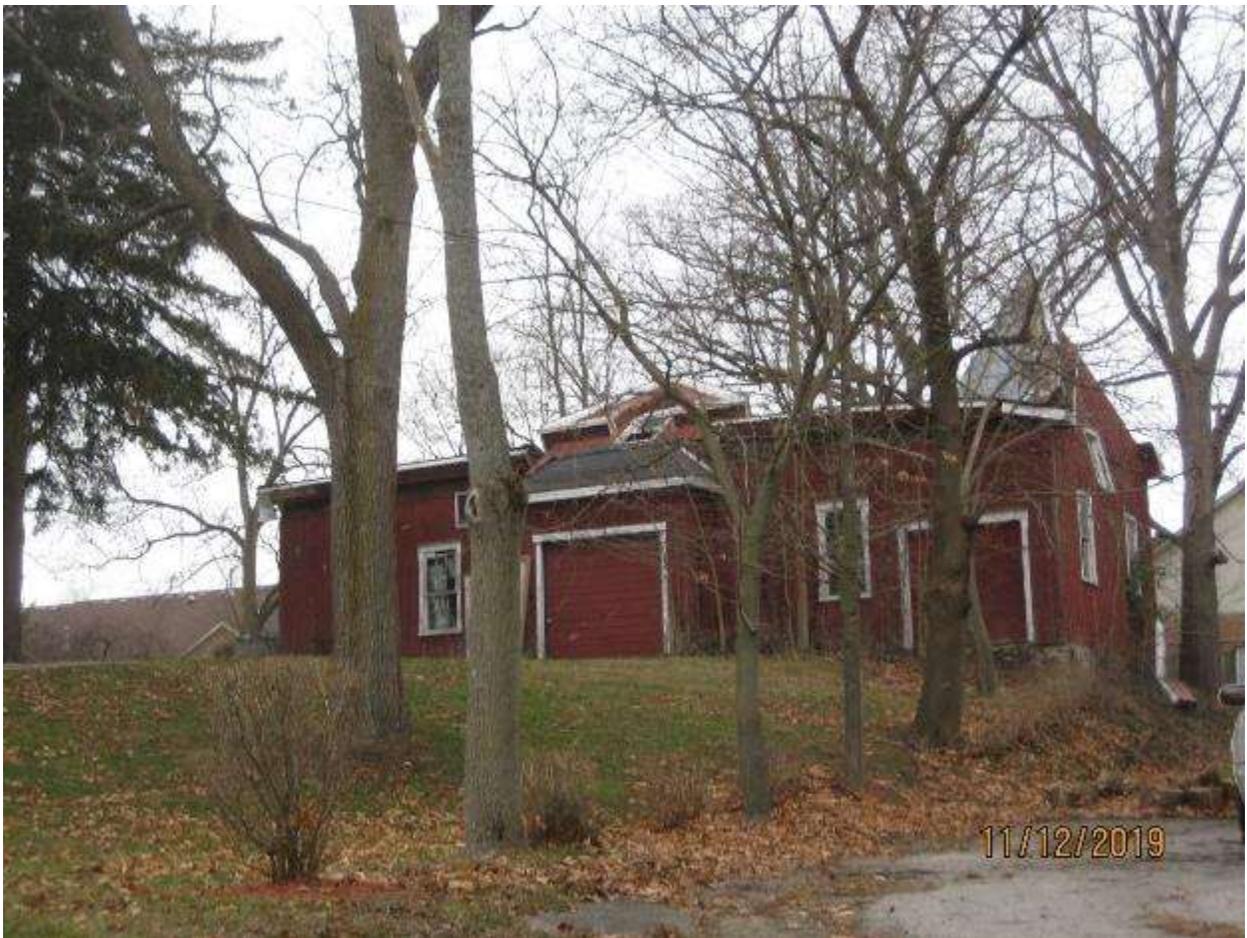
Photograph showing the east side of the accessory building as viewed from Halls Mill Road, showing the collapse of the roof framing, December 11, 2019.
